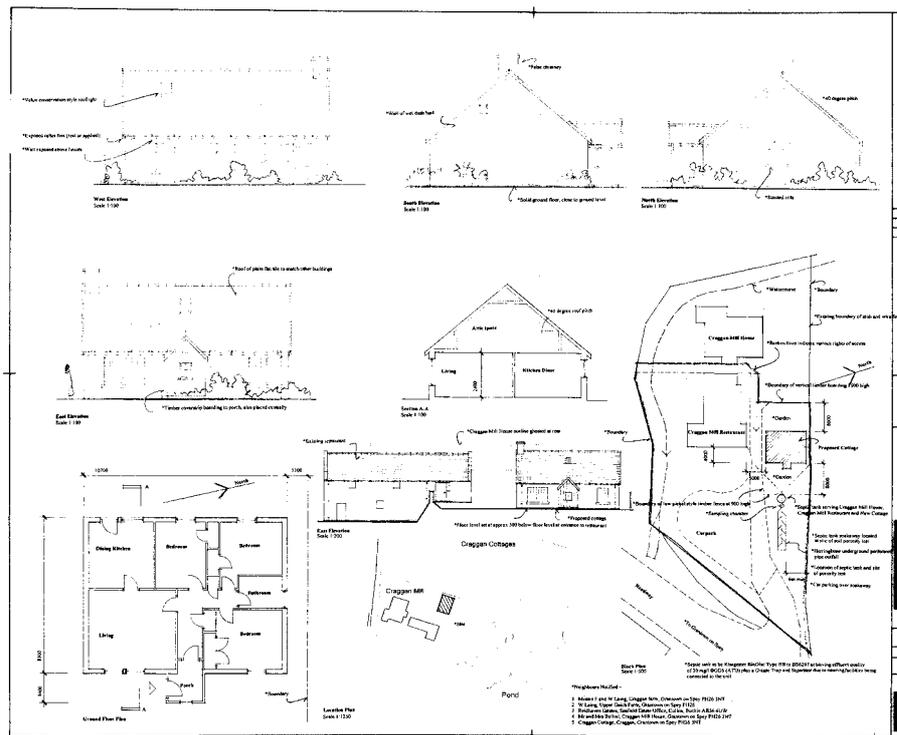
Site Plan, Elevations, Floor Plan, and Site Section
